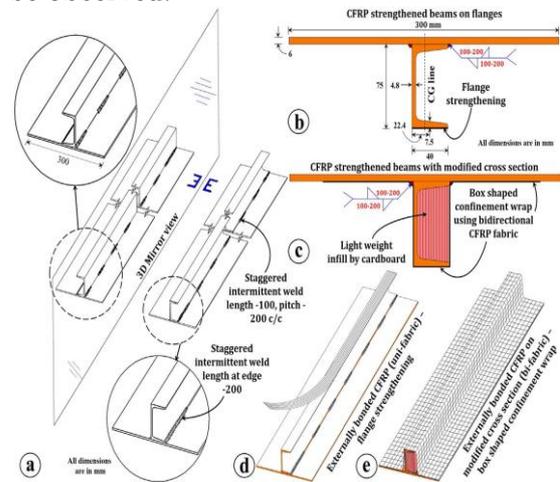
Built-up test specimen fabrication: (a) 3D normal and mirror view welding details; (b) Cross sectional view of the flange strengthening specimen; (c) Cross sectional view of the modified cross section strengthening specimen; (d) CFRP bonding method on flange strengthening specimens; (e) CFRP bonding method- box shaped confinement wrap [9].
